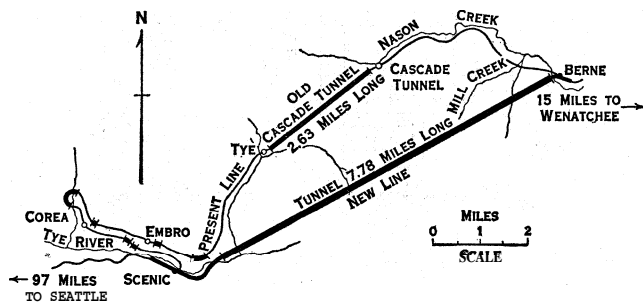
MAP SHOWING NEW AND OLD TUNNEL IN THE CASCADE MOUNTAINS, STATE OF WASHINGTON, U.S.
